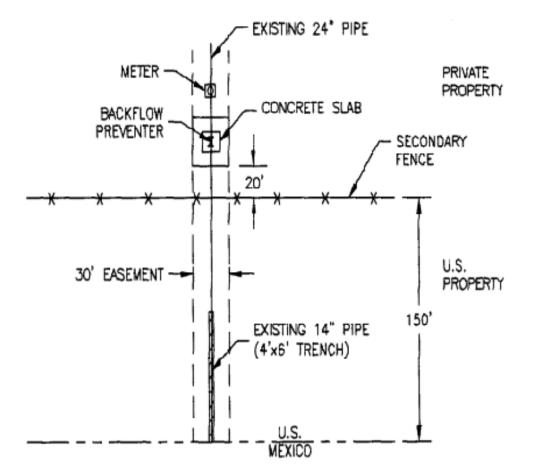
United States - Mexico Emergency Water Deliveries Connection. Area of pipe replacement site at emergency connection (Source: SDCWA, 1999)
